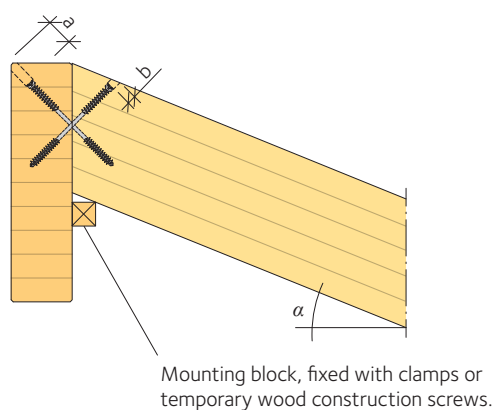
Example of fixing a glulam roof beam to a glulam binder with a wood screw joint
